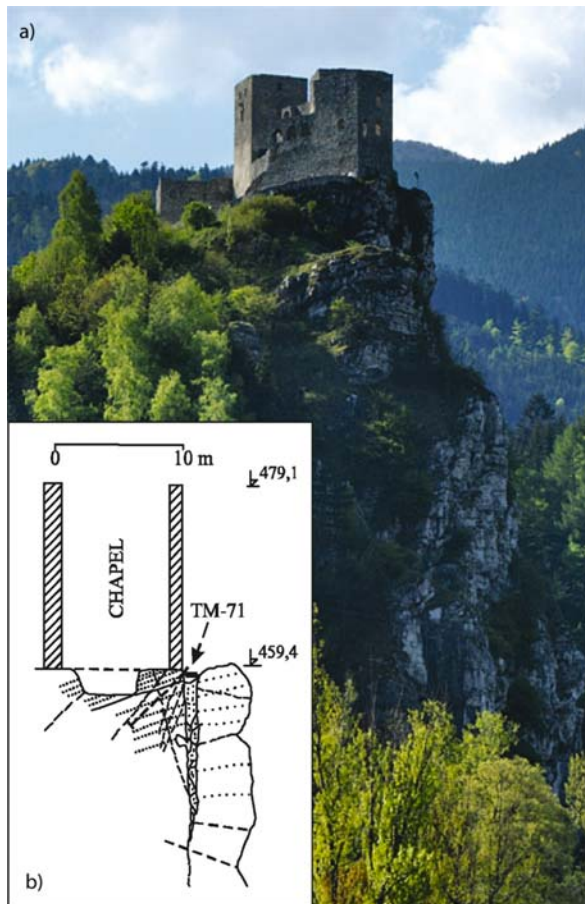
Strecno castle with typical cross-section showing the location of the crack gauge TM71
